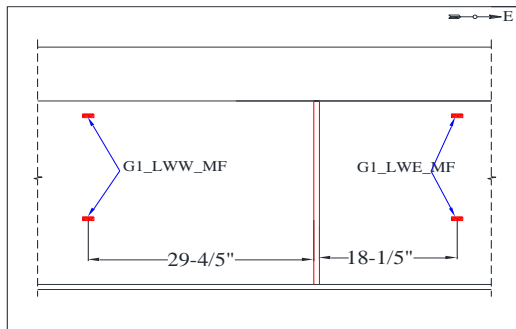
Plan view of test specimen showing sections used for strain gage planning
